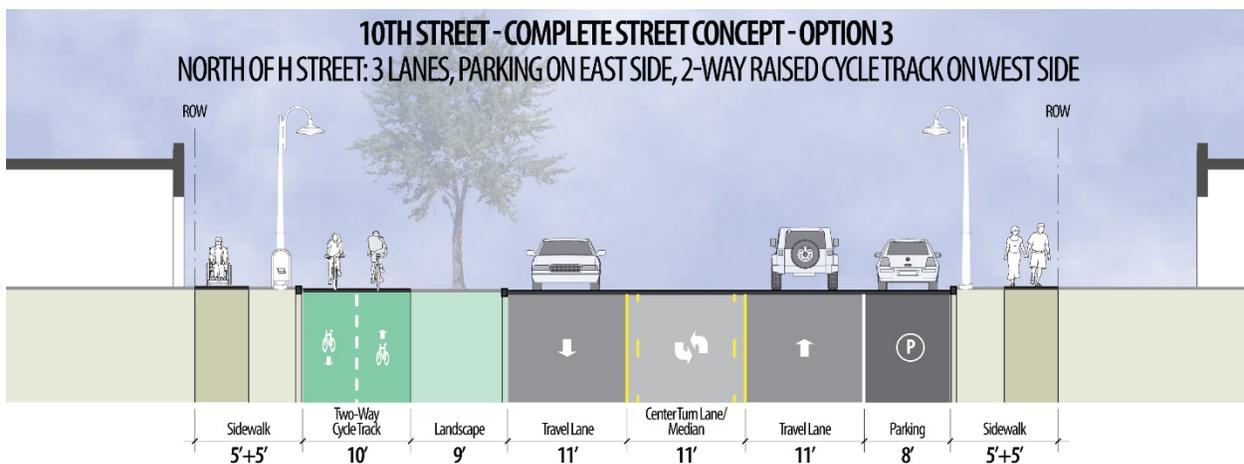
Proposed Complete Street Concept - Option 3 Condition North of H Street
